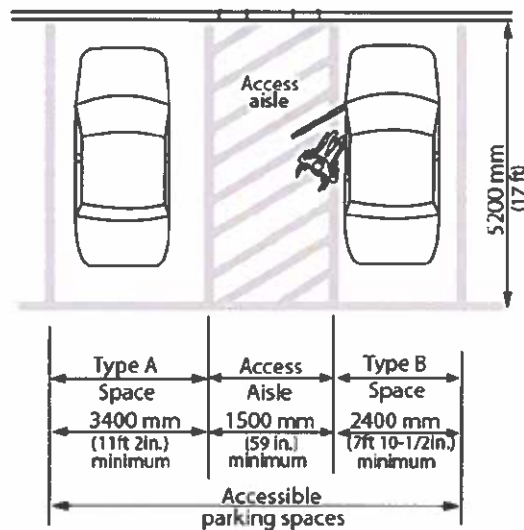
Illustration of Accessible Parking Spaces and Access Aisles
